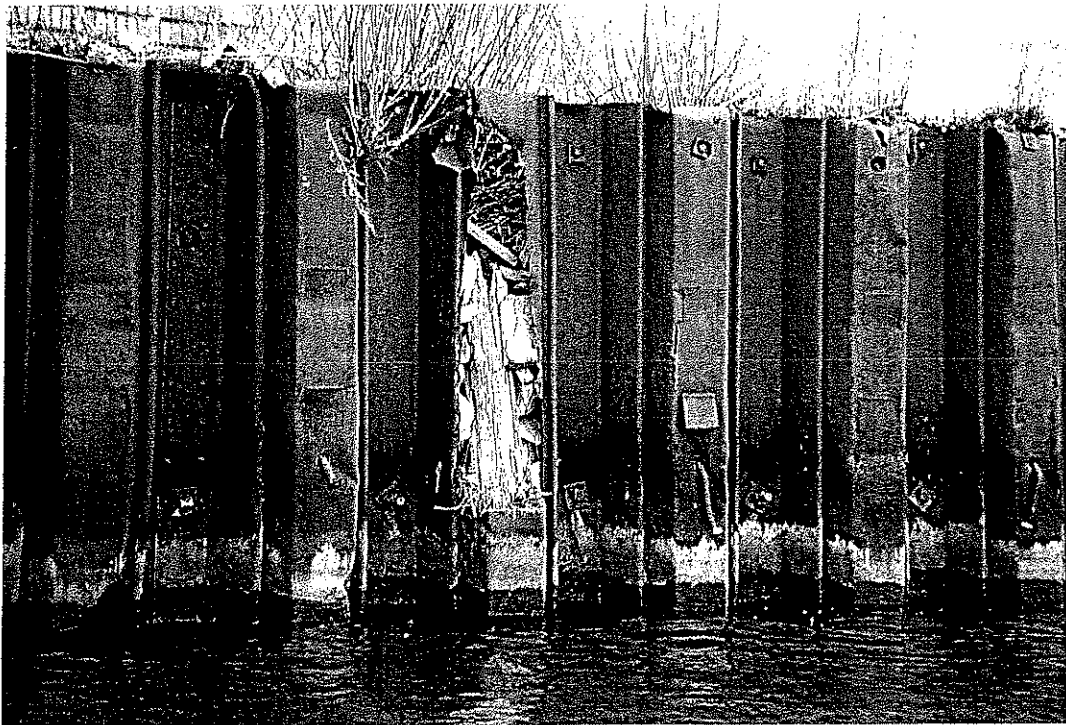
View of Typical Concrete Cap Condition along Waterline at Station 0+20, Looking North.
